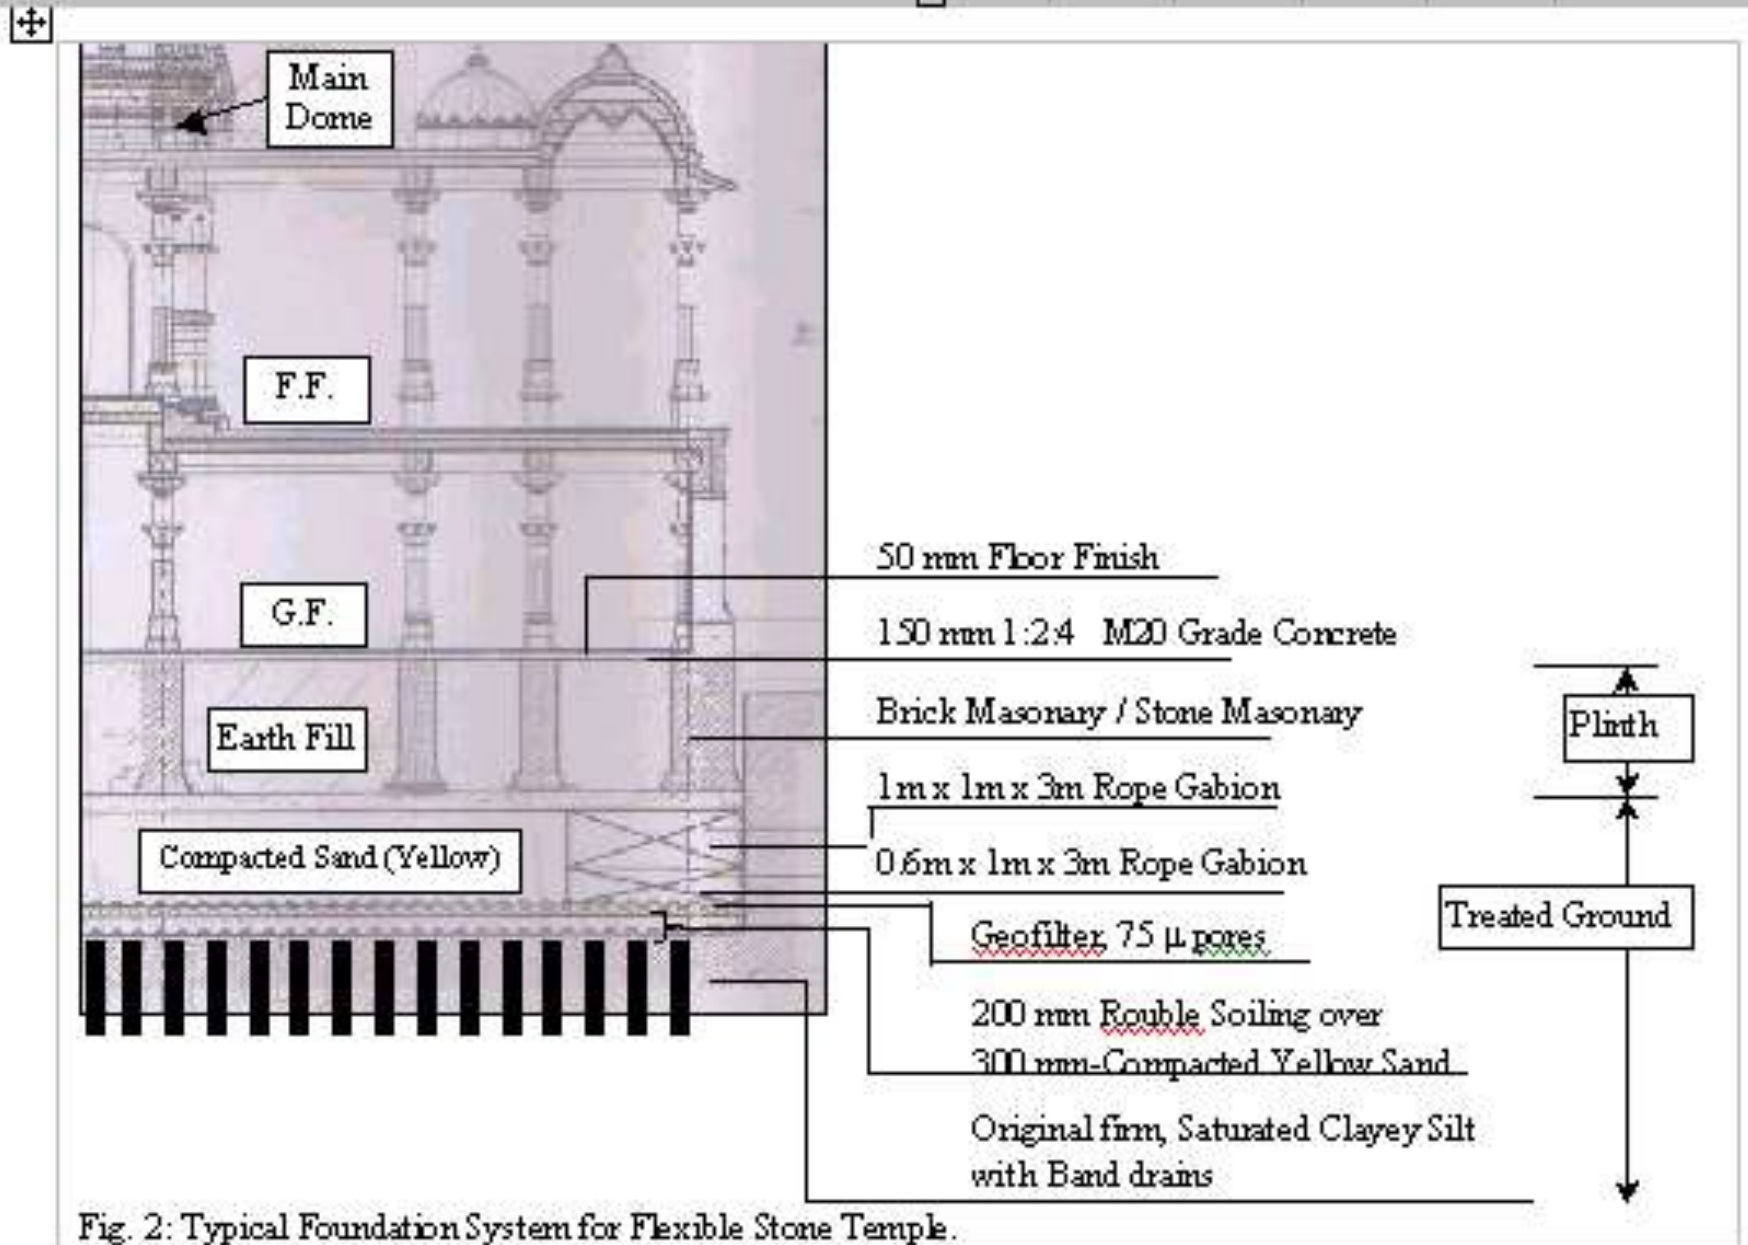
Typical Foundation System for Flexible Stone Temple.
